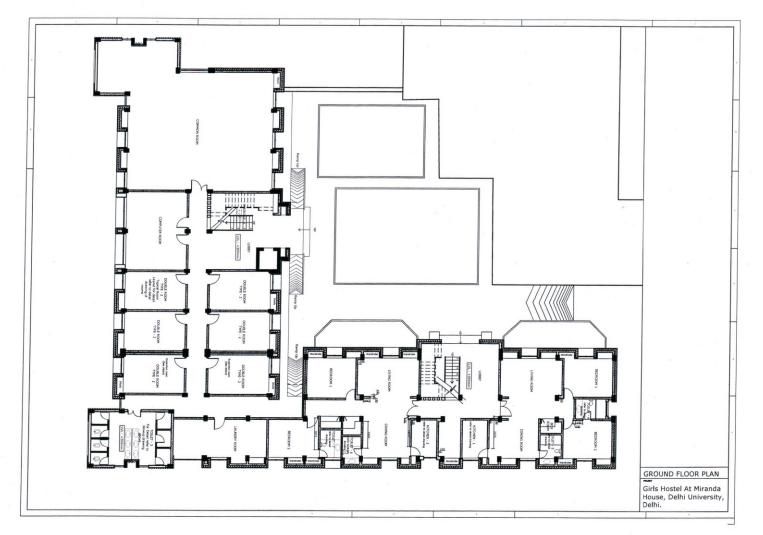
(j): Layout plan of MH Hostel New Block: Ground Floor
